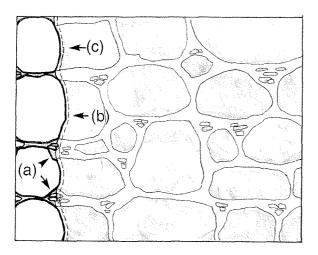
Diagram E: Minimal fairing out. Section/elevation of prepared wall surface prior to harling. (1) (a) Pinned up joints recessed behind the line of the high points of the main stones.
